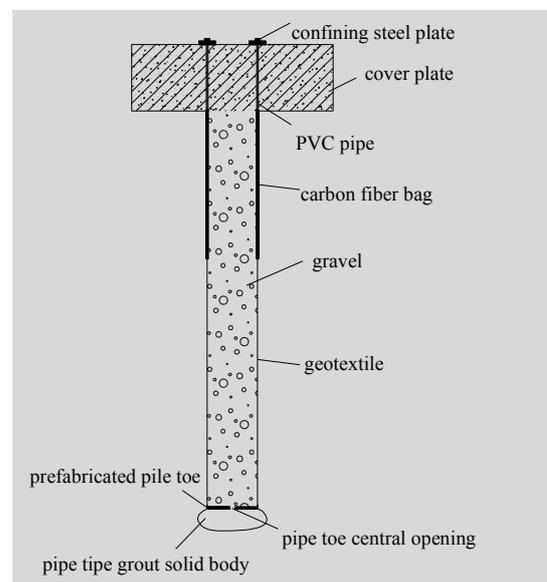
Pre-drilling embedded geotextile gravel grouting pile structure.
